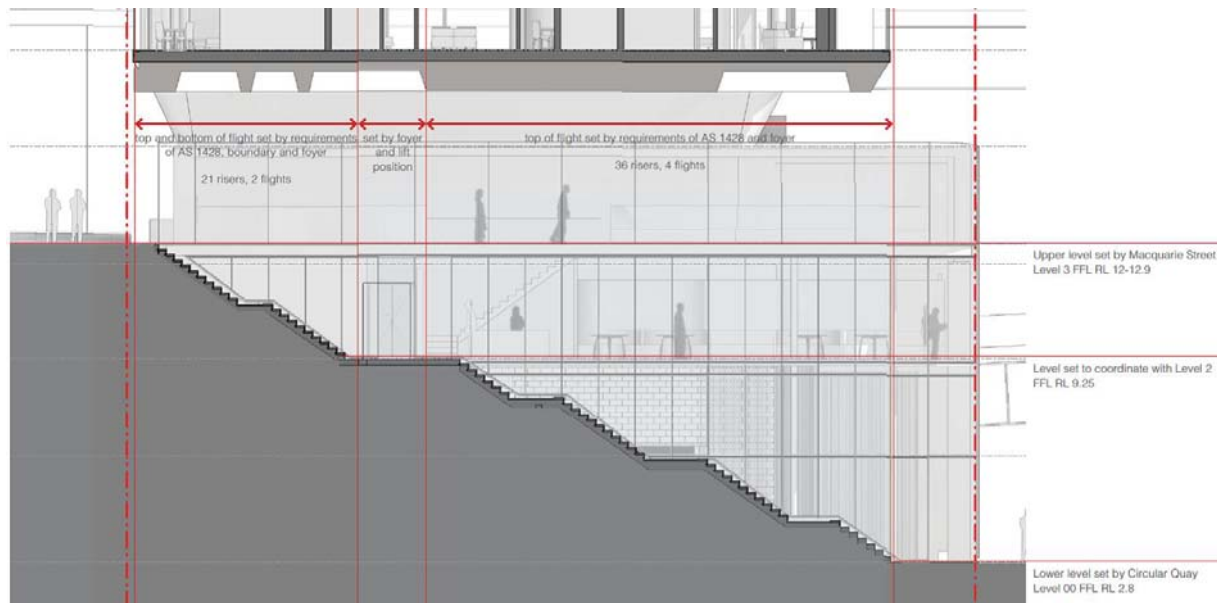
Section through the through site link illustrating the minimum tread, risers and landings to comply with the Australian Standards.
